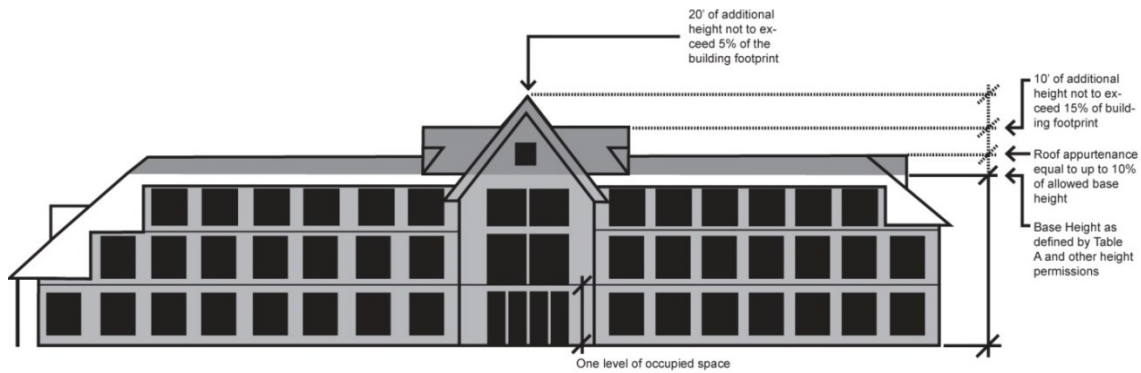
B: Application of the Additional Height for Design Improvement Limit
